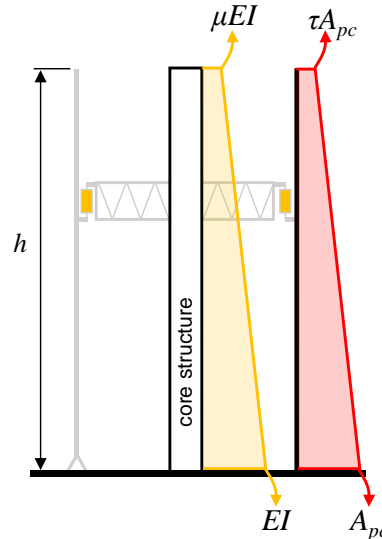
Illustration of the core structure flexural rigidity and perimeter column cross-sectional area vary with the building elevation
